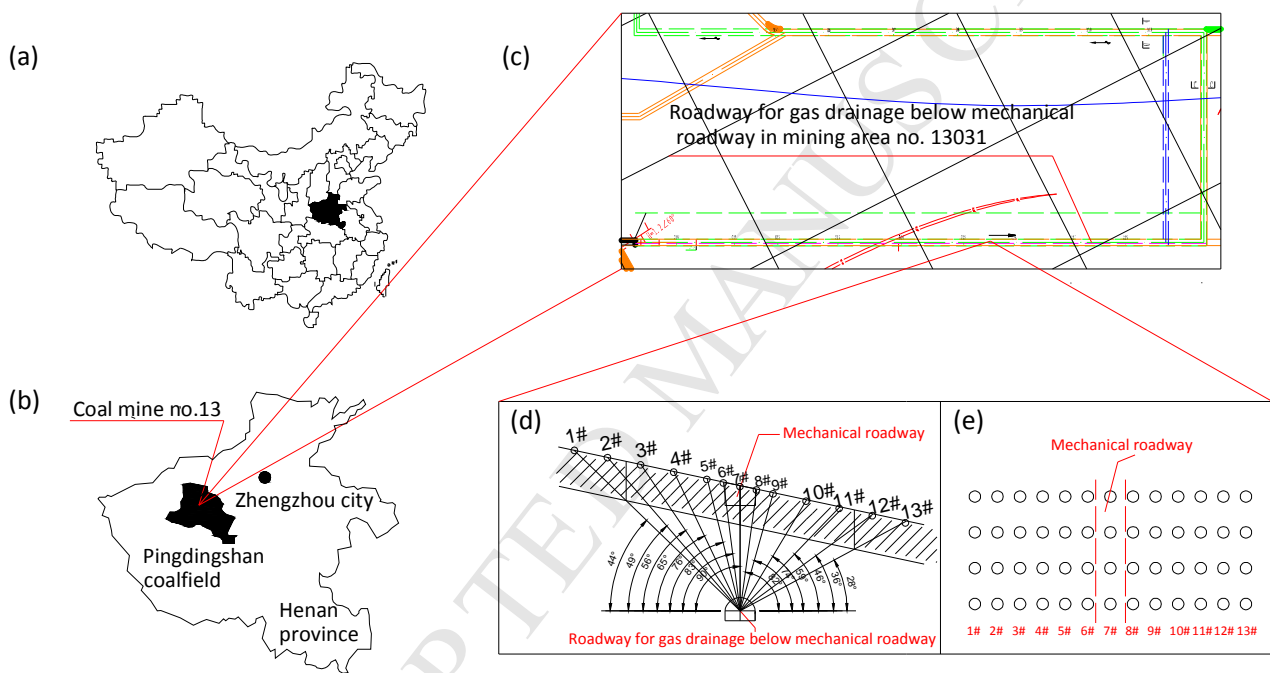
Study site and original design of boreholes. (a) Location of Henan province in China. (b) Location of Pingdingshan coalfield in Henan province. (c) Roadway layout of mining area no. 13031 and the location of roadway for gas drainage below the mechanical roadway. (d) The original cross-measure borehole arrangement in the roadway for gas drainage below the mechanical roadway (cross-section map). (e) The original cross-measure borehole arrangement in the roadway for gas drainage below the mechanical roadway (plane figure).
